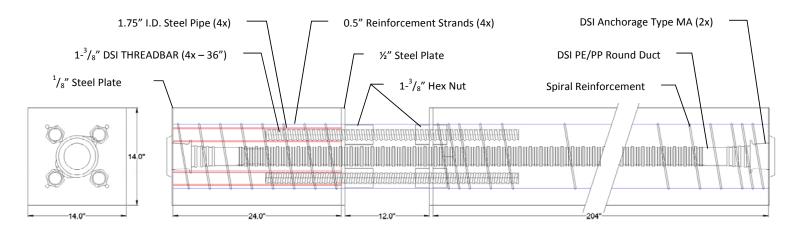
De-Tensioning Pile System Design. PVC and Flexible Connection Removed for Clarity
